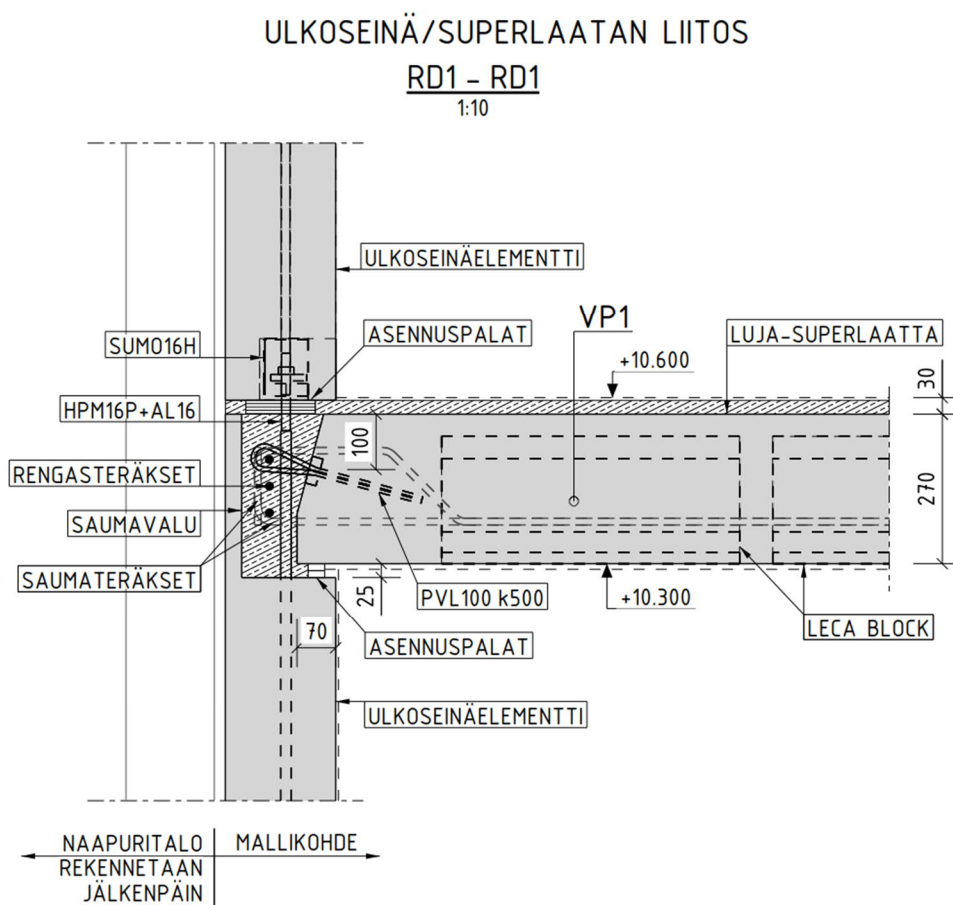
End-support connection (Tekla Structures drawing snapshot)
